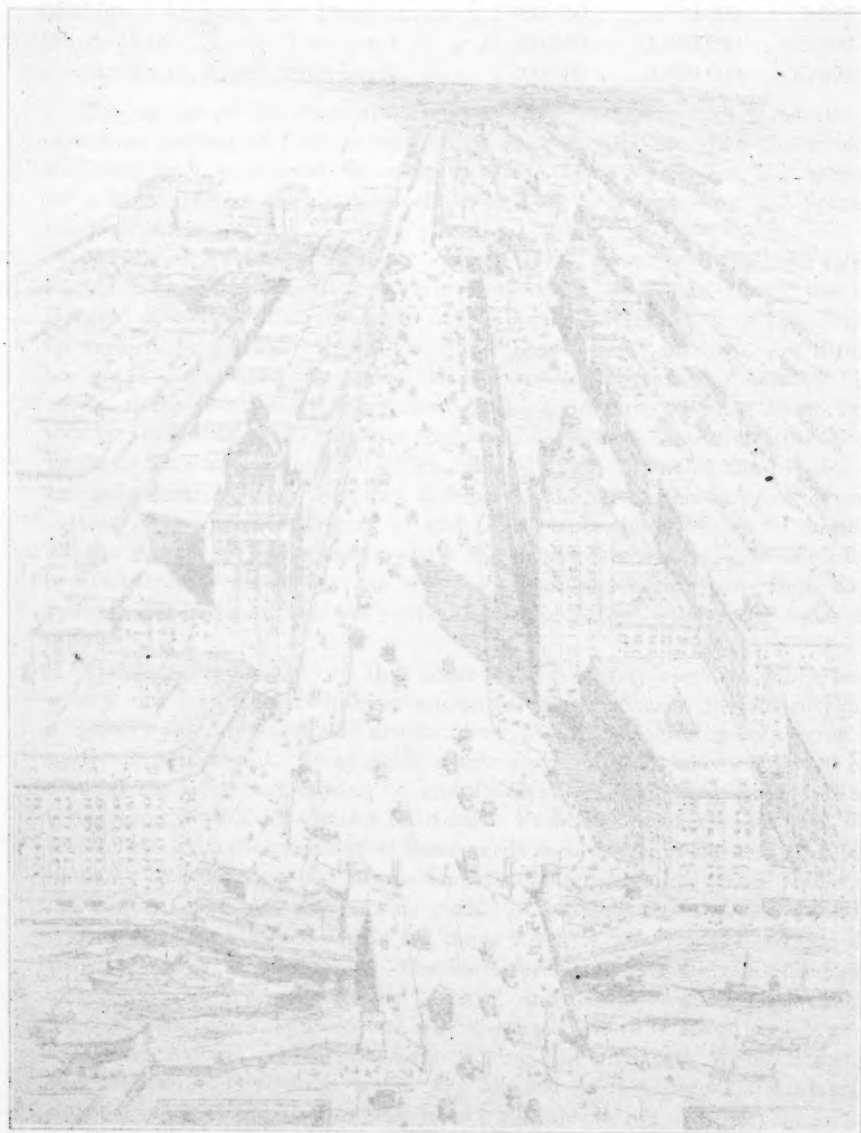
VIEW LOOKING NORTH ON MICHIGAN AVENUE IMPROVEMENT. The drawing shows the proposed improvements to the Michigan Avenue station, including the new building and the existing structures. The view is looking north along the avenue.
